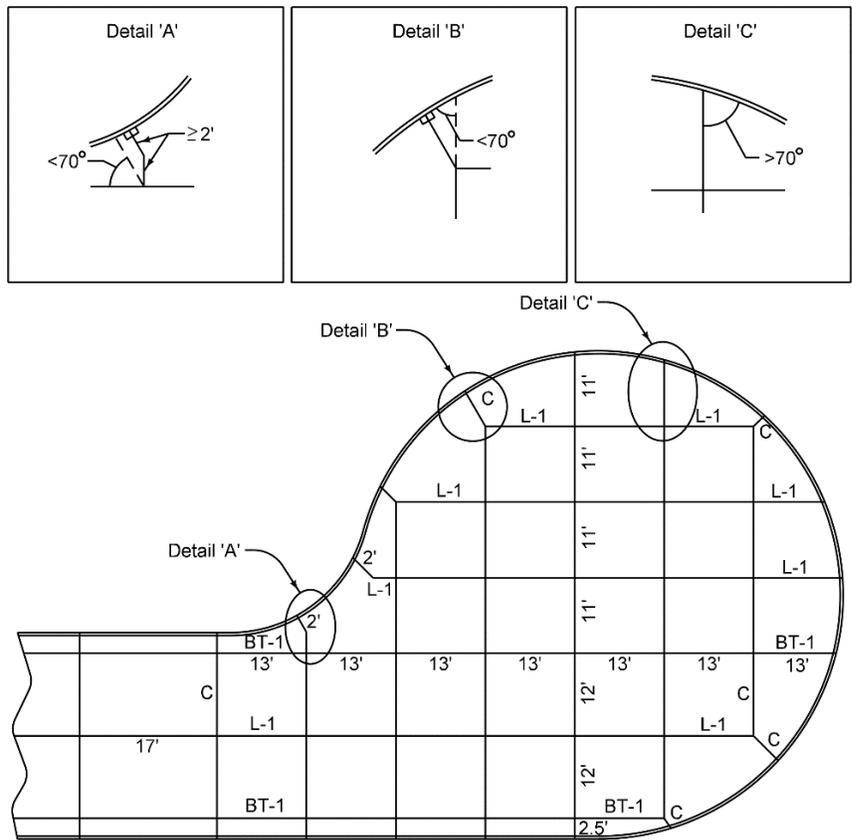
G-3.12: Final Jointing Layout - Gutterline Jointing Examples
